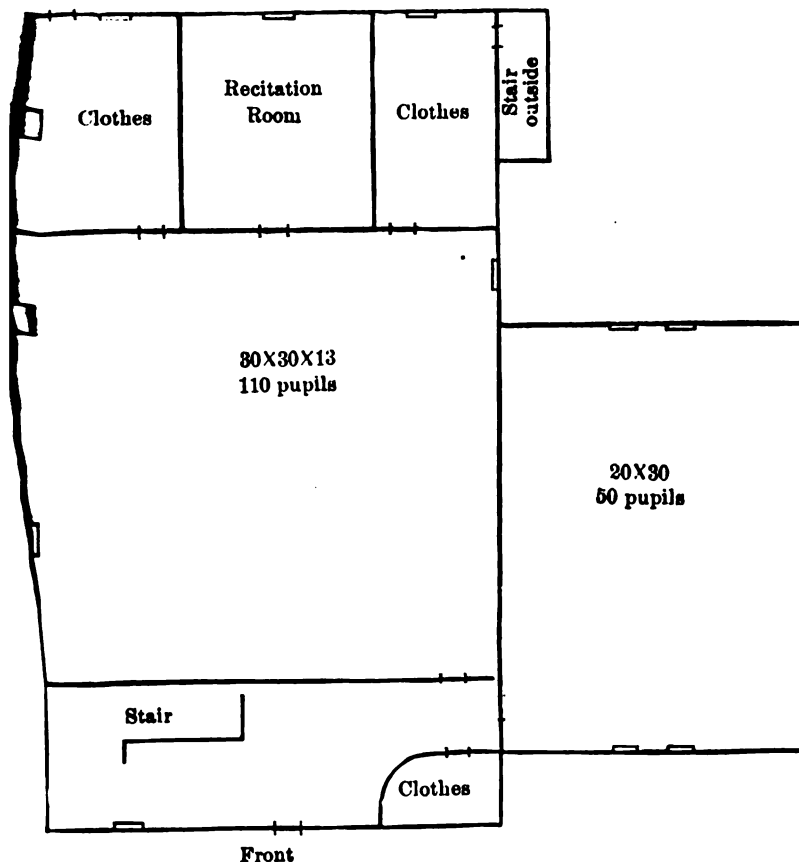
Francis Street School, Utica. Light insufficient in large room. Arrangement interfering with light. Very badly planned for use.
